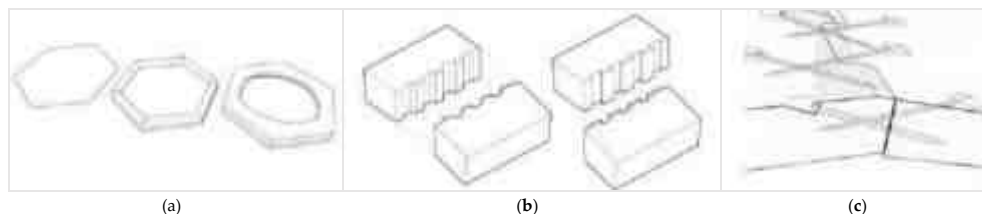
Types of plates and joints. The figure shows (a) Three types of plates: solid plates, an edge-reinforced plate, and a hollow component [19]. (b) Two types of joints: finger joint (left) and a dovetail (right) [19]. (c) Another type of joint: crossing screw connection [21].
